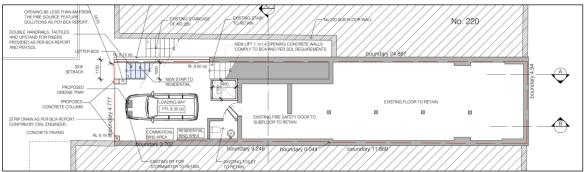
Proposed lower ground floor plan (source: Vivi building design, dated 13/12/2024)
